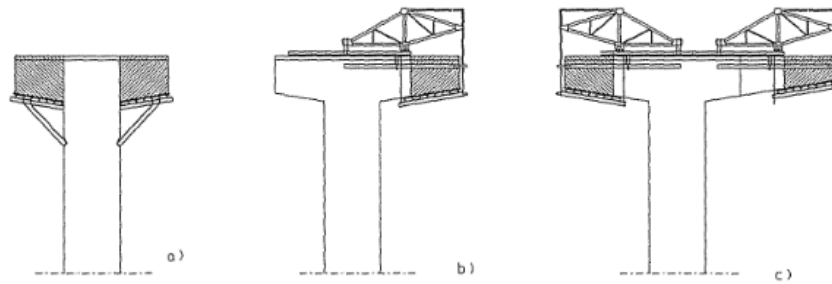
Balanced cantilever method with provisional scaffolding system [13].
